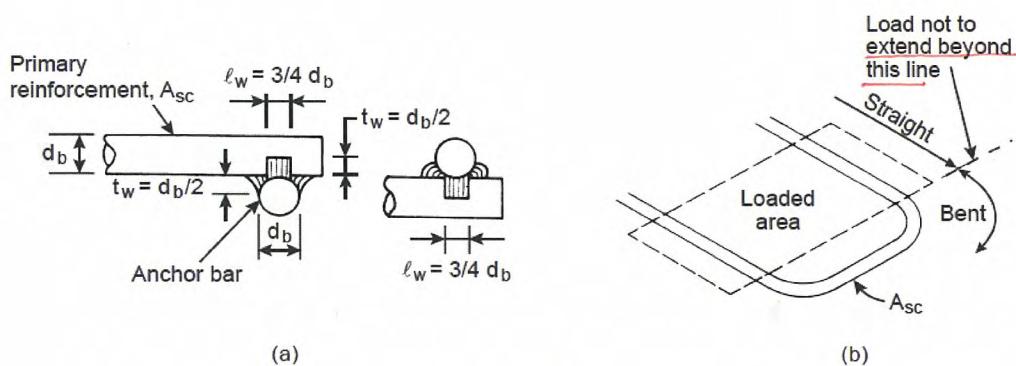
Anchorage Details Using (a) Cross-Bar Weld and (b) Loop Bar Detail
